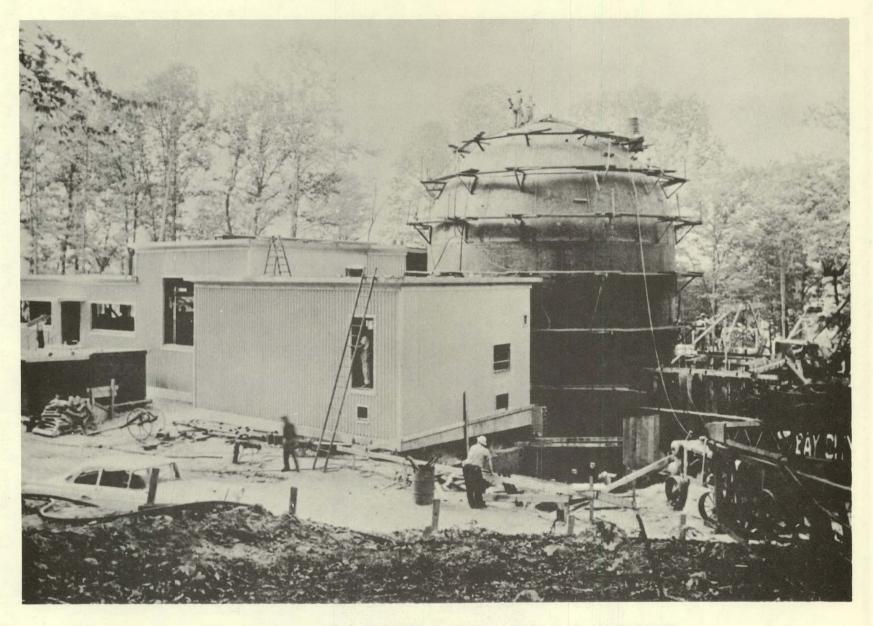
VIEW OF VAPOR CONTAINER AND BUILDING UNDER CONSTRUCTION
